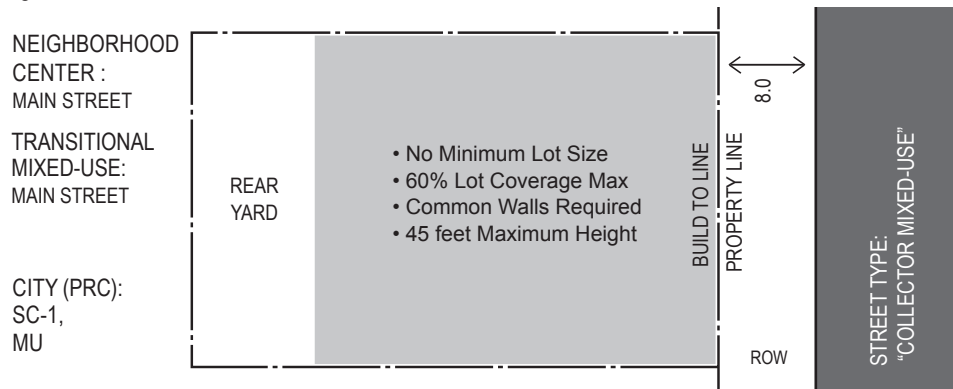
12: NEIGHBORHOOD CENTER - LOT PLAN DIAGRAM
